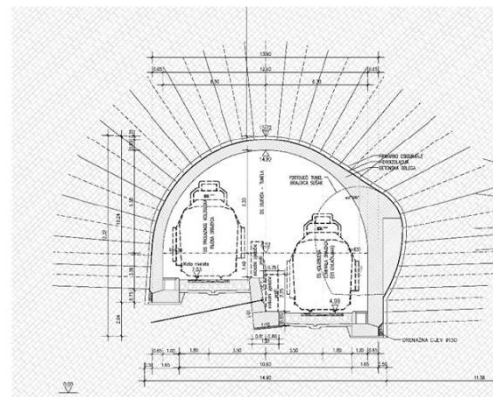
New cross section of the tunnel Brajdica with anchors, along which the sensors are embedded
